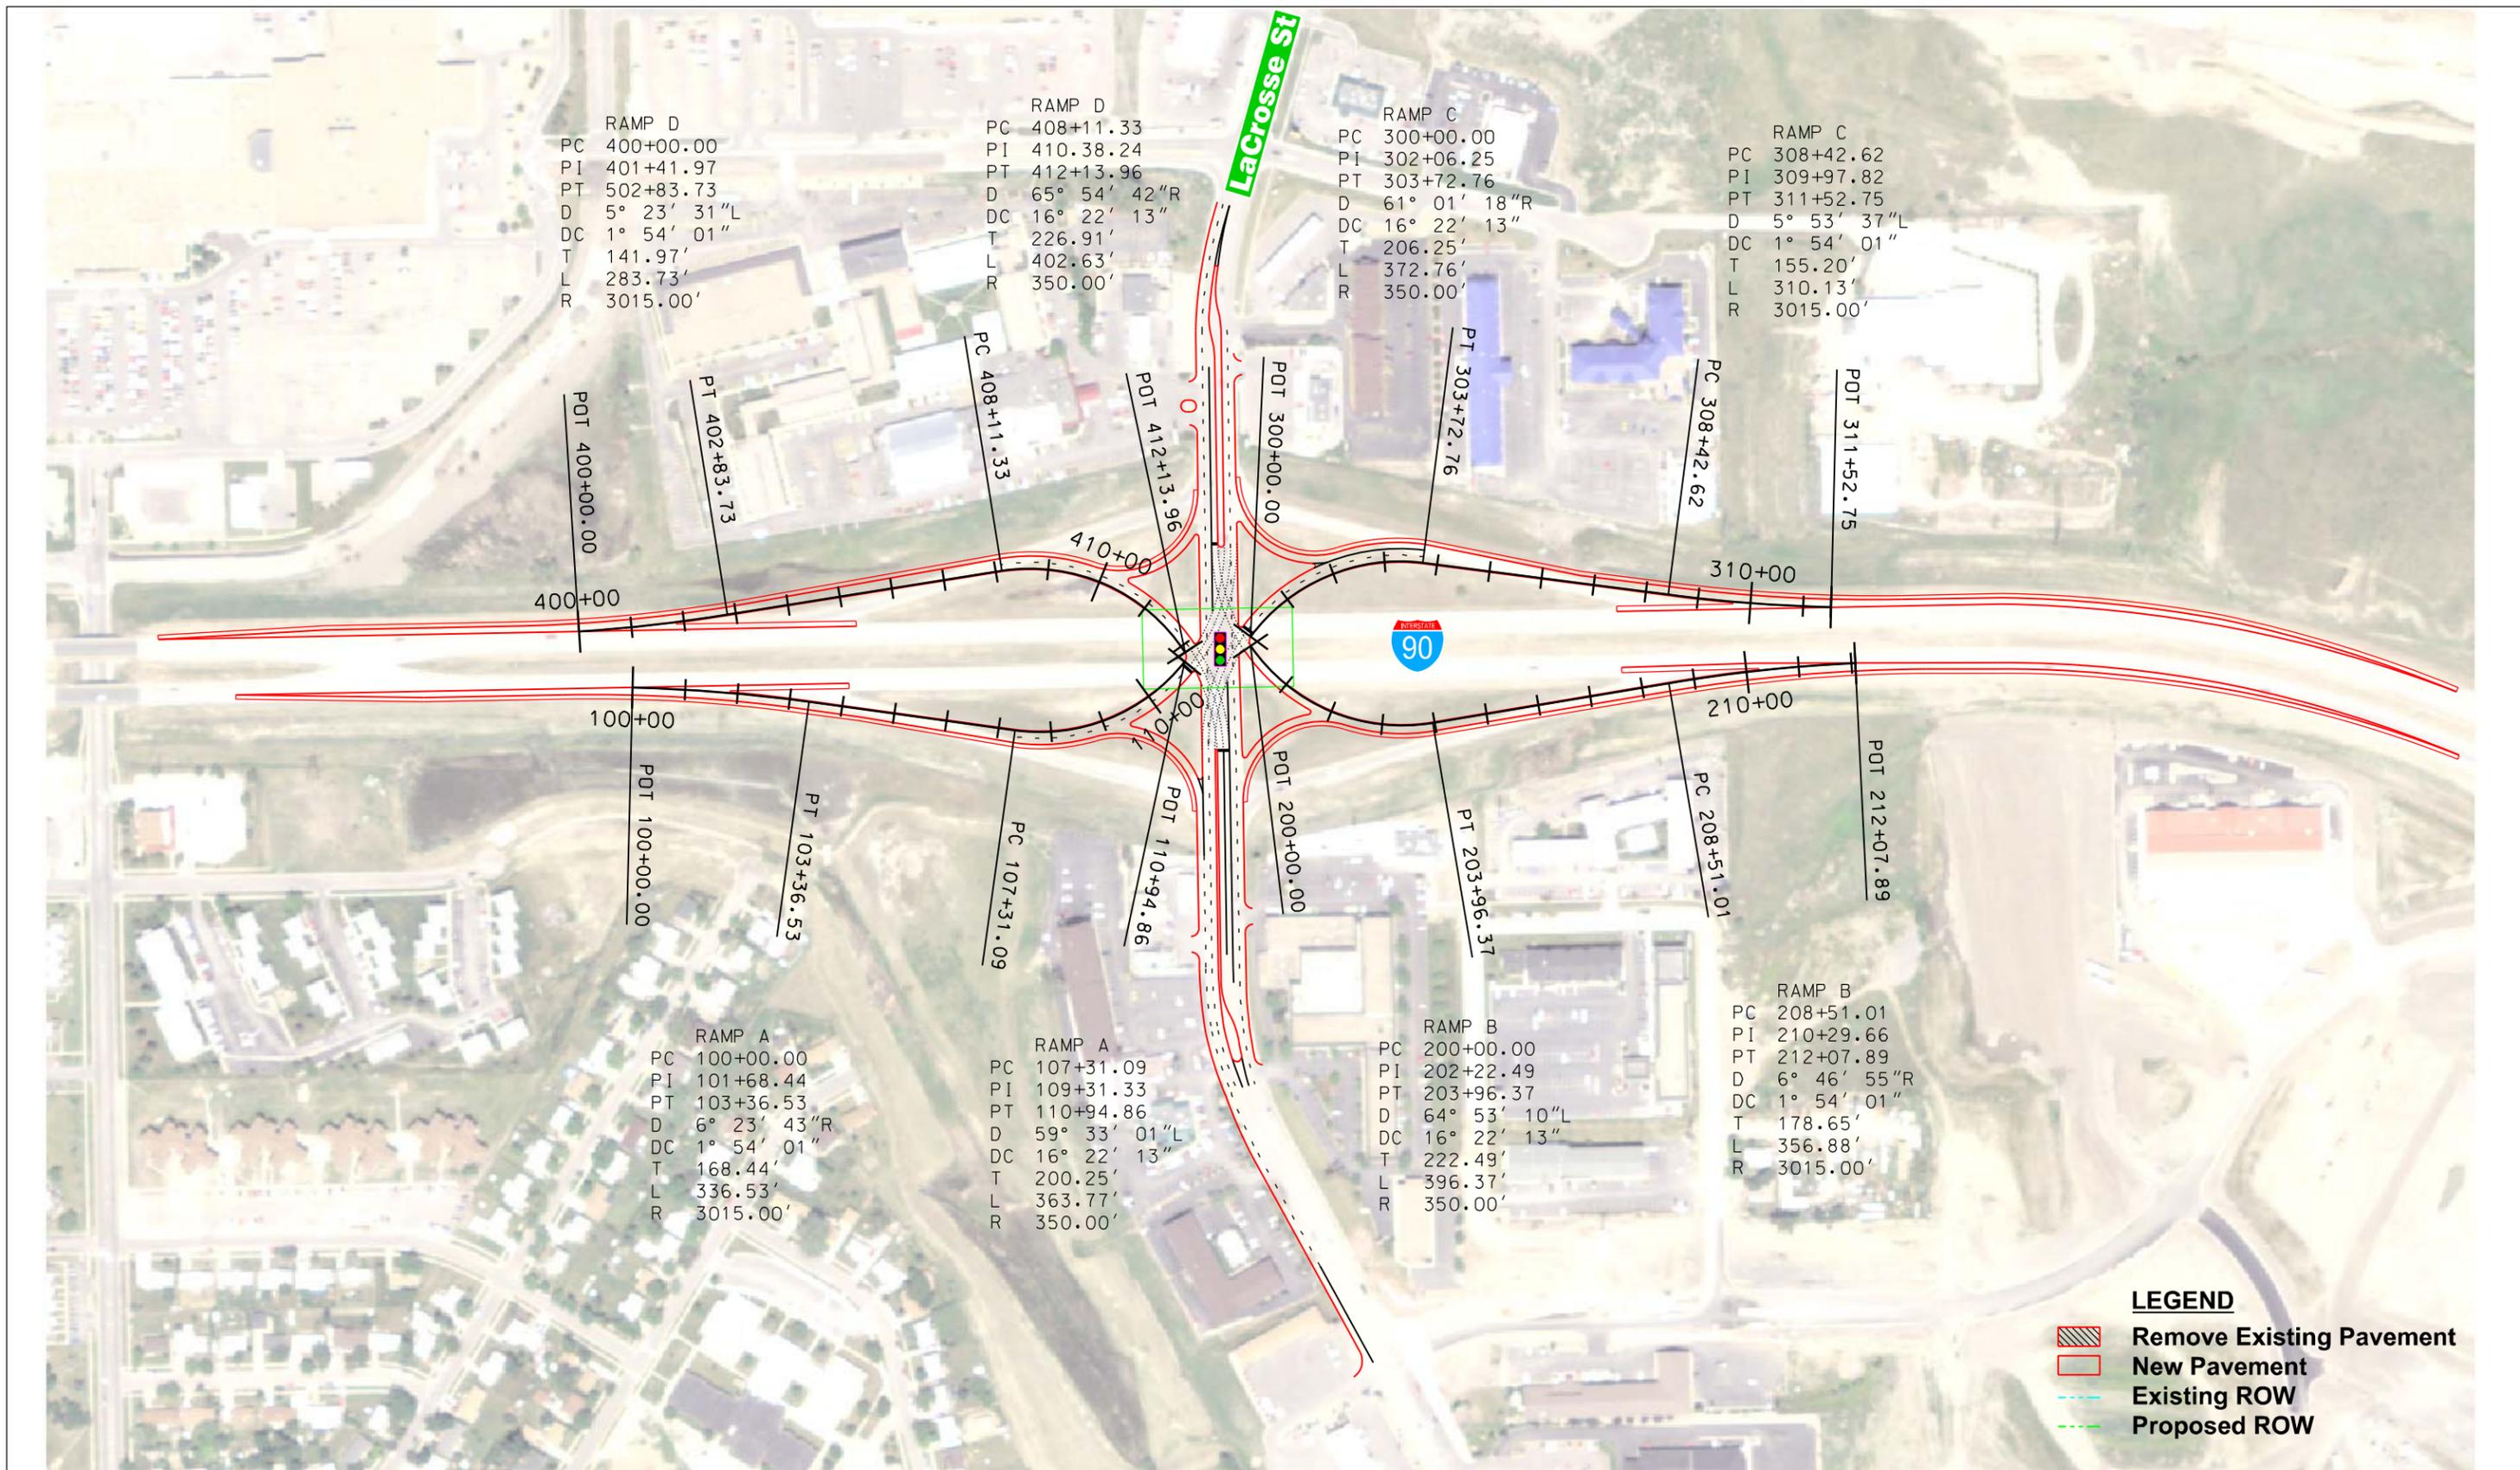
I-90 Exit 59 Alternative 1 – Bridge Widening and Lane Improvements
